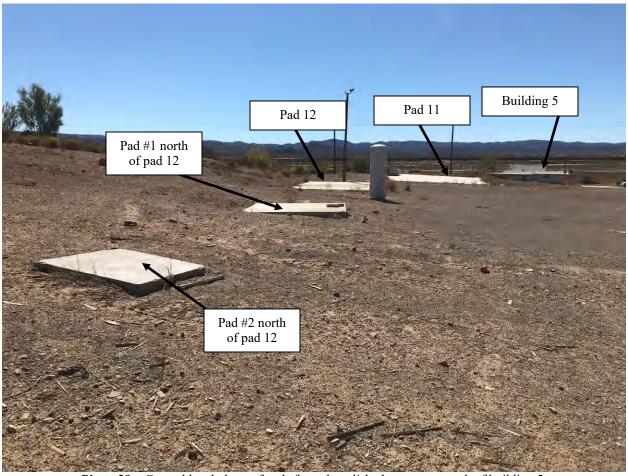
Ground level photo of pads from demolished structures north of building 5.
